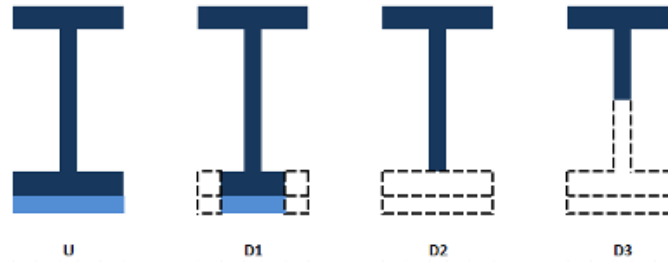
Cross-Section of Damaged Bridge Girder at Damage Location: undamaged (U): 50% reduction in the bottom flange and cover plate (D1): 100% reduction in the bottom flange and cover plate (D2): and 100% reduction in the bottom flange and cover plate and 50% reduction of the web (D3).
